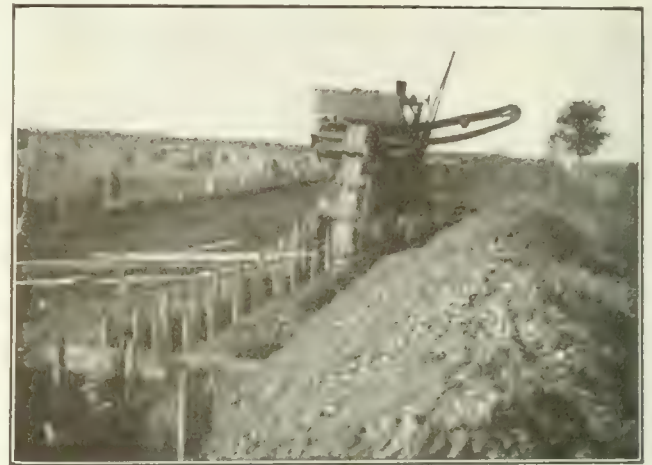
Excavating 20-ft. Trench from Town to Disposal Works.
